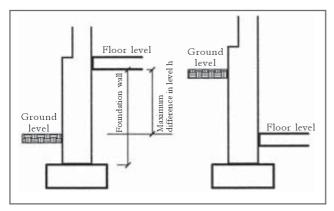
Foundation walls (HBM Part 2, Section 3, Figure DM9)
